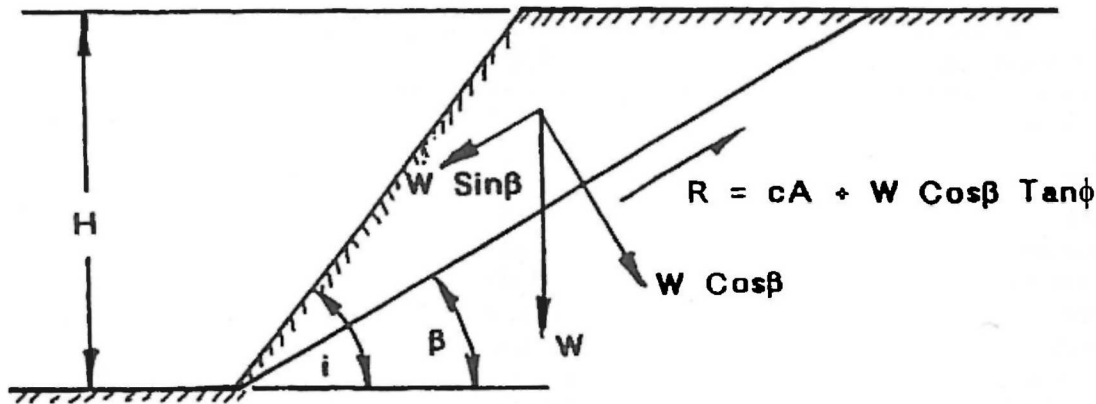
Dimensions and forces in a rock slope with a potential failure plane (Hoek, 1970a).
